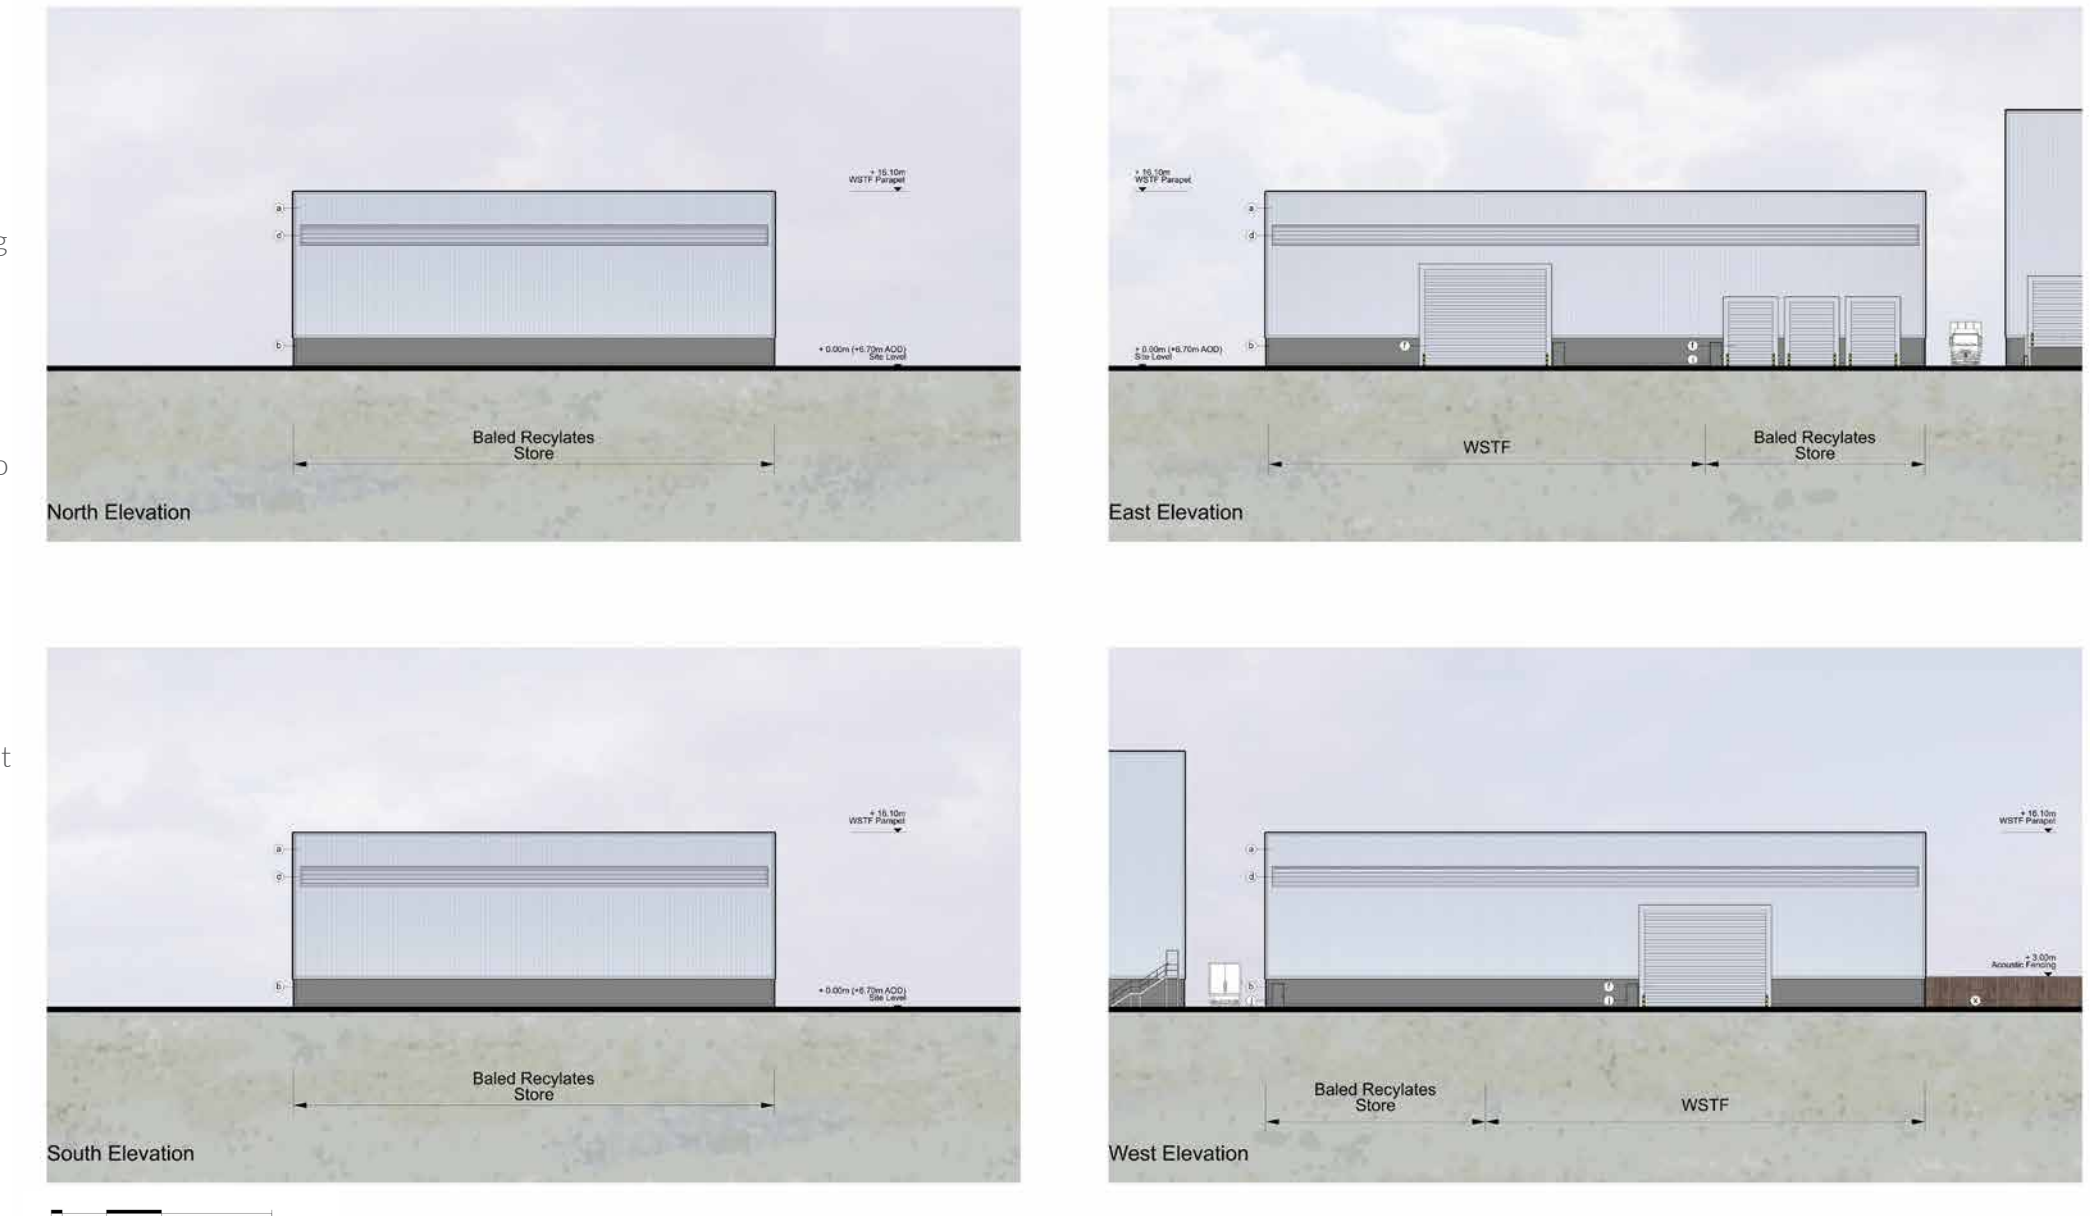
Proposed WSTF elevations – extract from drawings PL305 & 306
